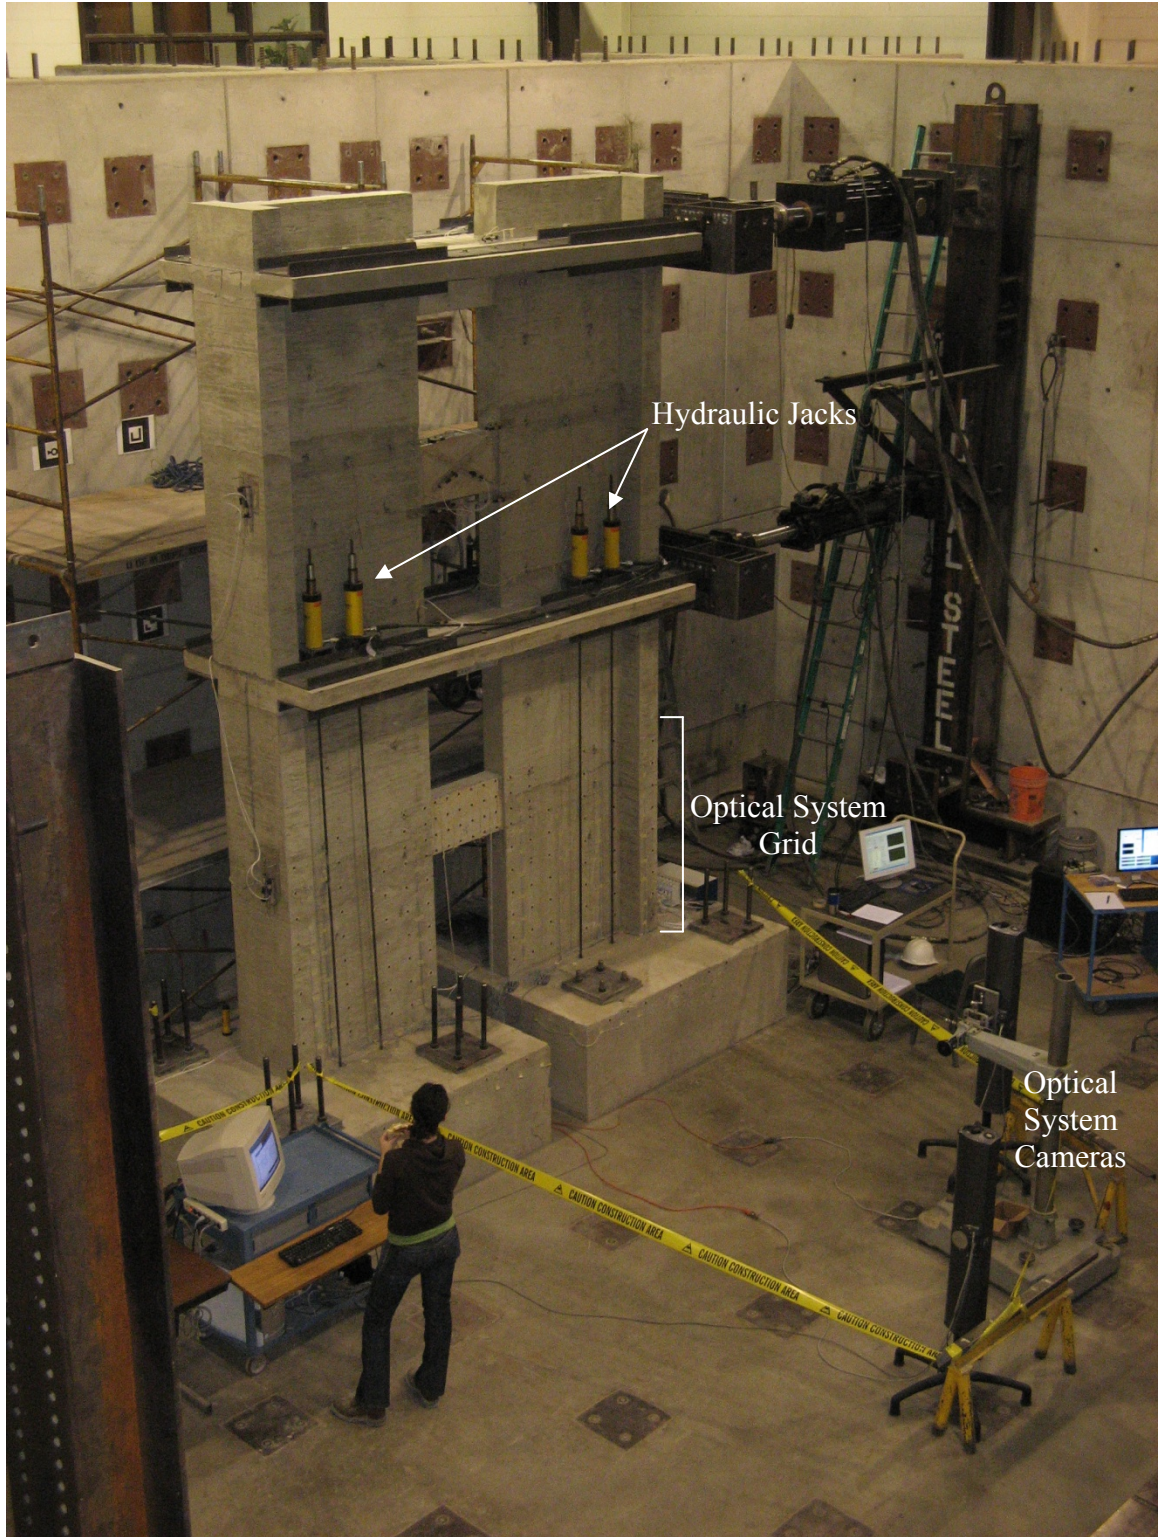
Photo of specimen, fully instrumented, prior to testing
